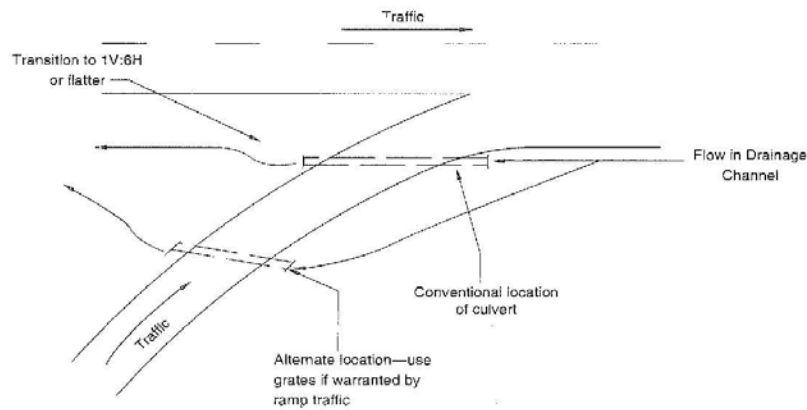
Alternate Location for a Parallel Drainage Culvert
